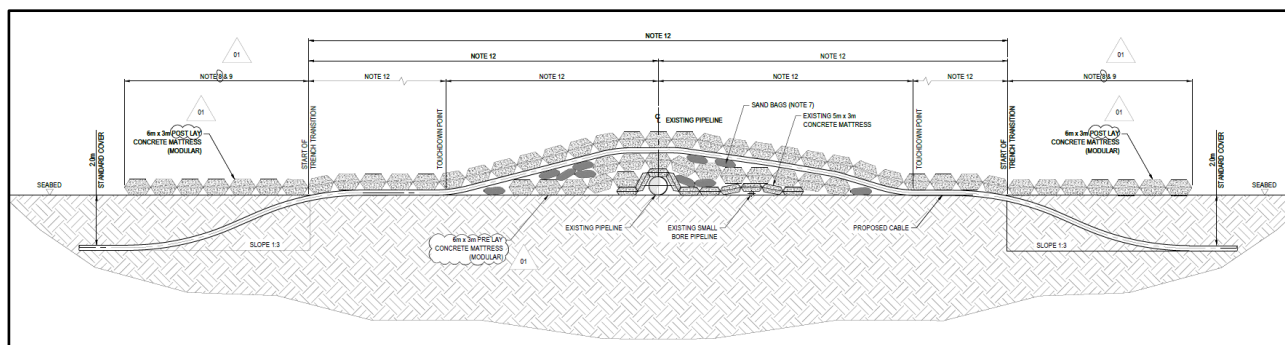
Cross Section Of Typical Arrangement For Crossing Of Existing Seabed Pipeline
